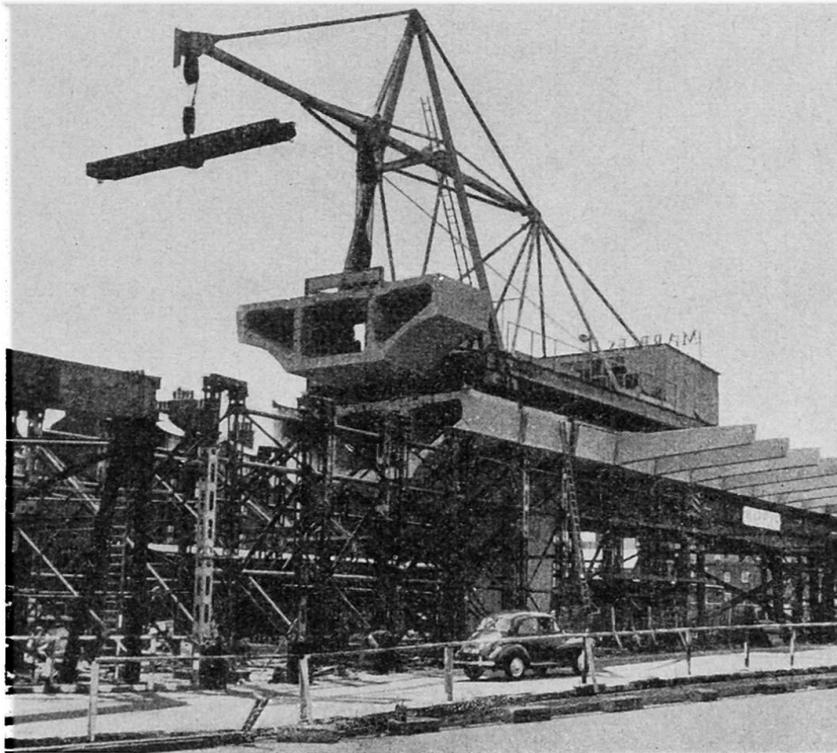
Precast concrete units for Hammersmith Flyover.
